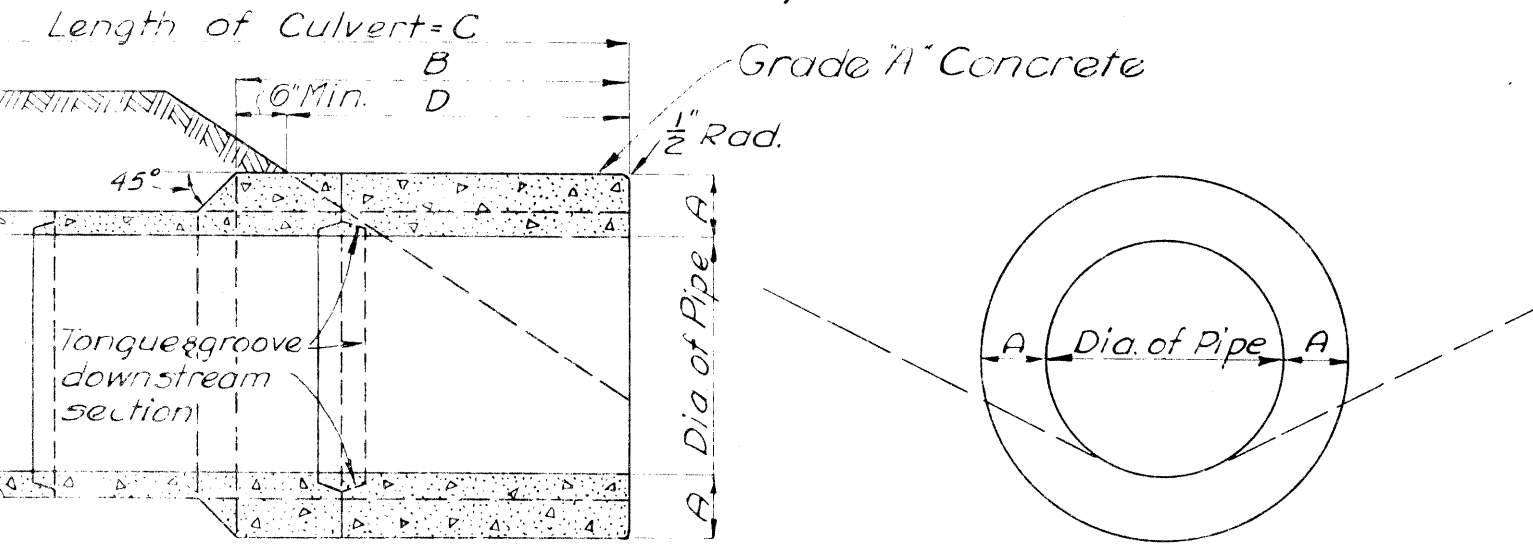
DETAIL OF RING TO BE USED ON CORRUGATED METAL & CAST IRON PIPE
